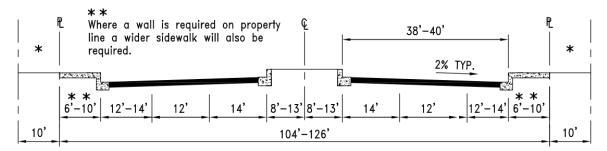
Existing Typical Section for Primary Arterial (Residential Street)
